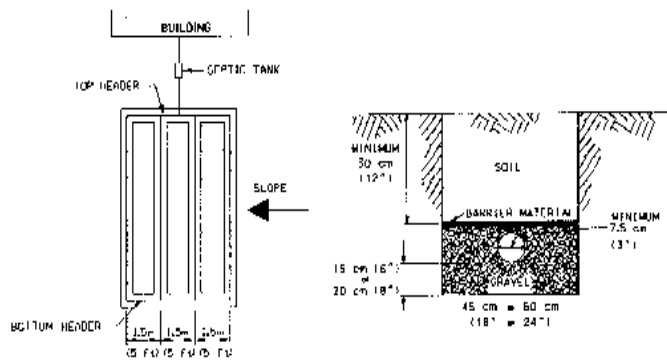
Typical standard disposal field Figure A.1.1 Typical trench cross section
